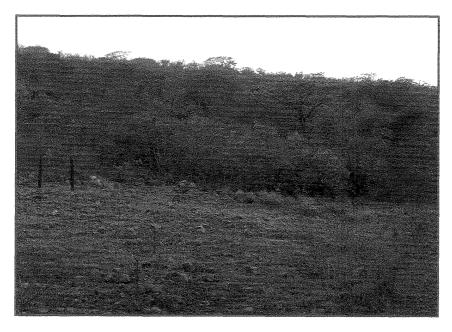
View of the North eastern section of the existing borrow pit proposed for the reservoir construction at Diambele village.
